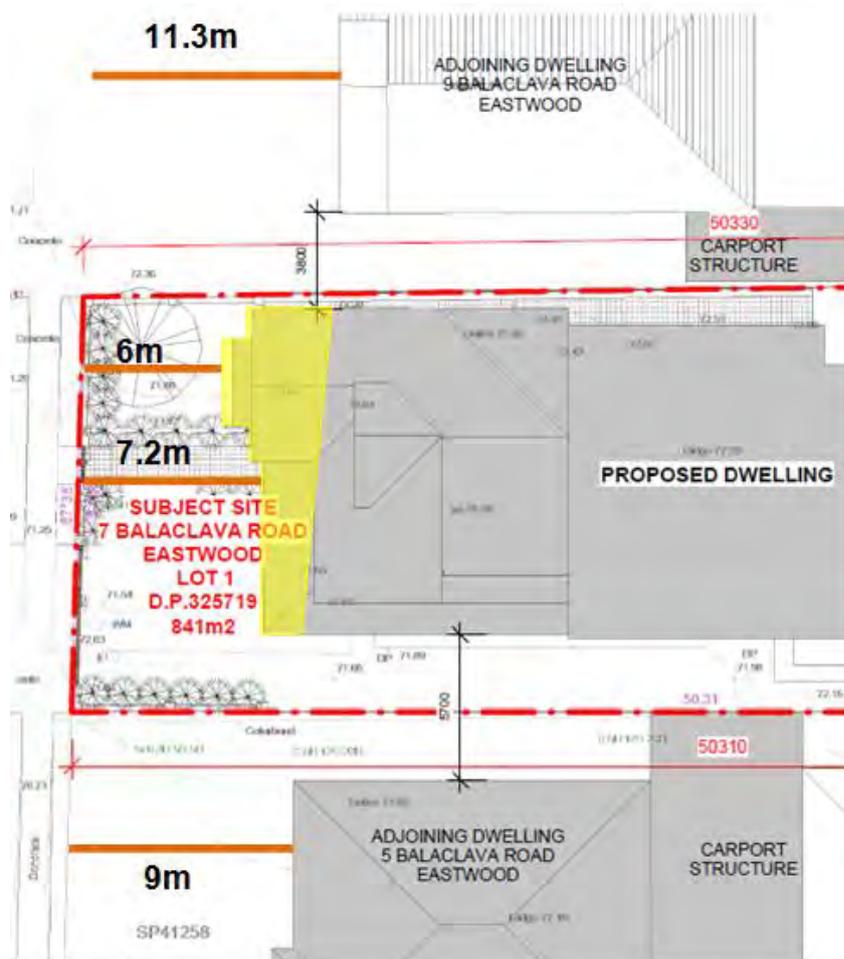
Proposed building projection forward of neighbouring buildings shaded in yellow.
